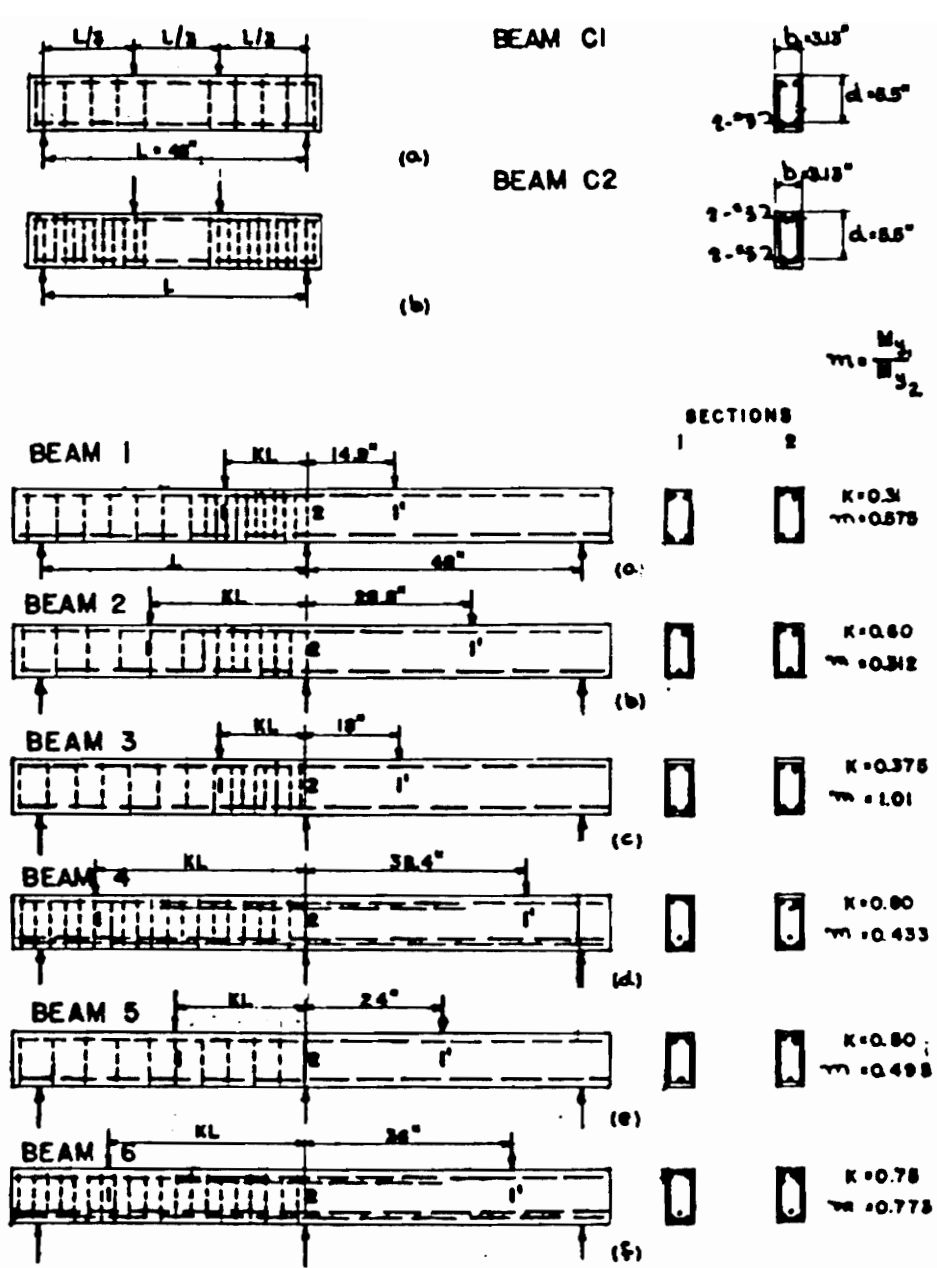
Details of Beams tested by Berwanger et al. (1960)
